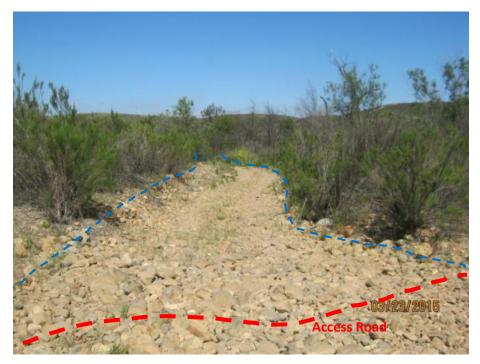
Feature 25 is an ephemeral drainage located in between Location 65 and Location 66. Project activity includes vehicular access through the drainage as it crosses the road. Photograph taken facing northwest.
